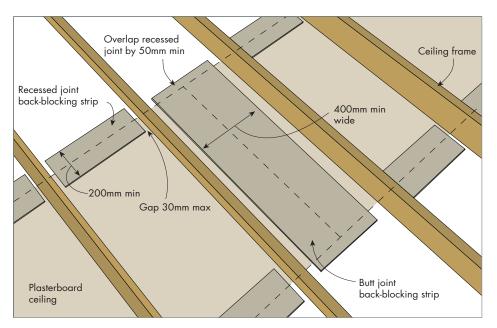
Placement of Back-Blocking Strips For Recessed and Butt Joints
